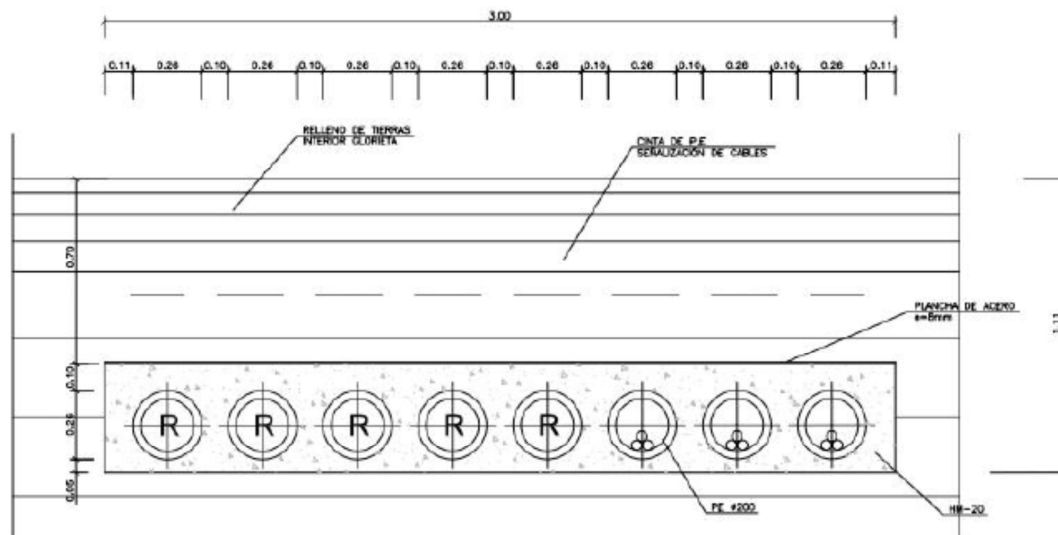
Prism to execute in L'Estany del Port Avenue (source: Esteyco)
